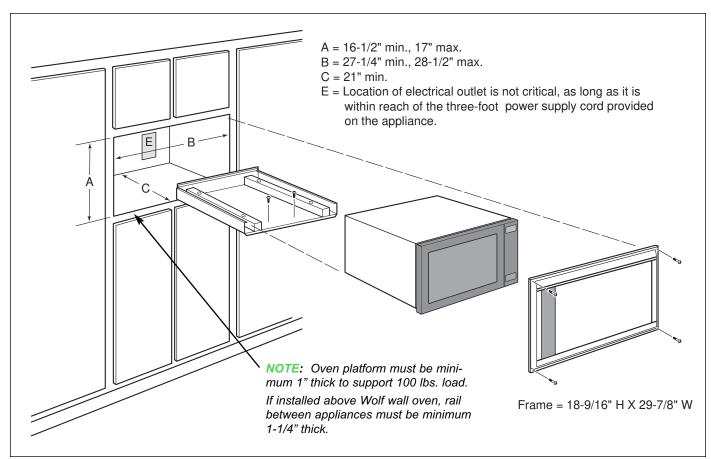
Rough-in Opening Dimensions and Trim Kit Installation
